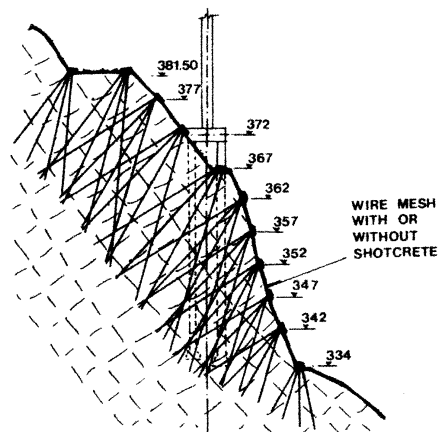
Rodovia dos Immigrants, Sao Paulo. RRP reinforcement in fissured rock (after Lizzi, 1982)
